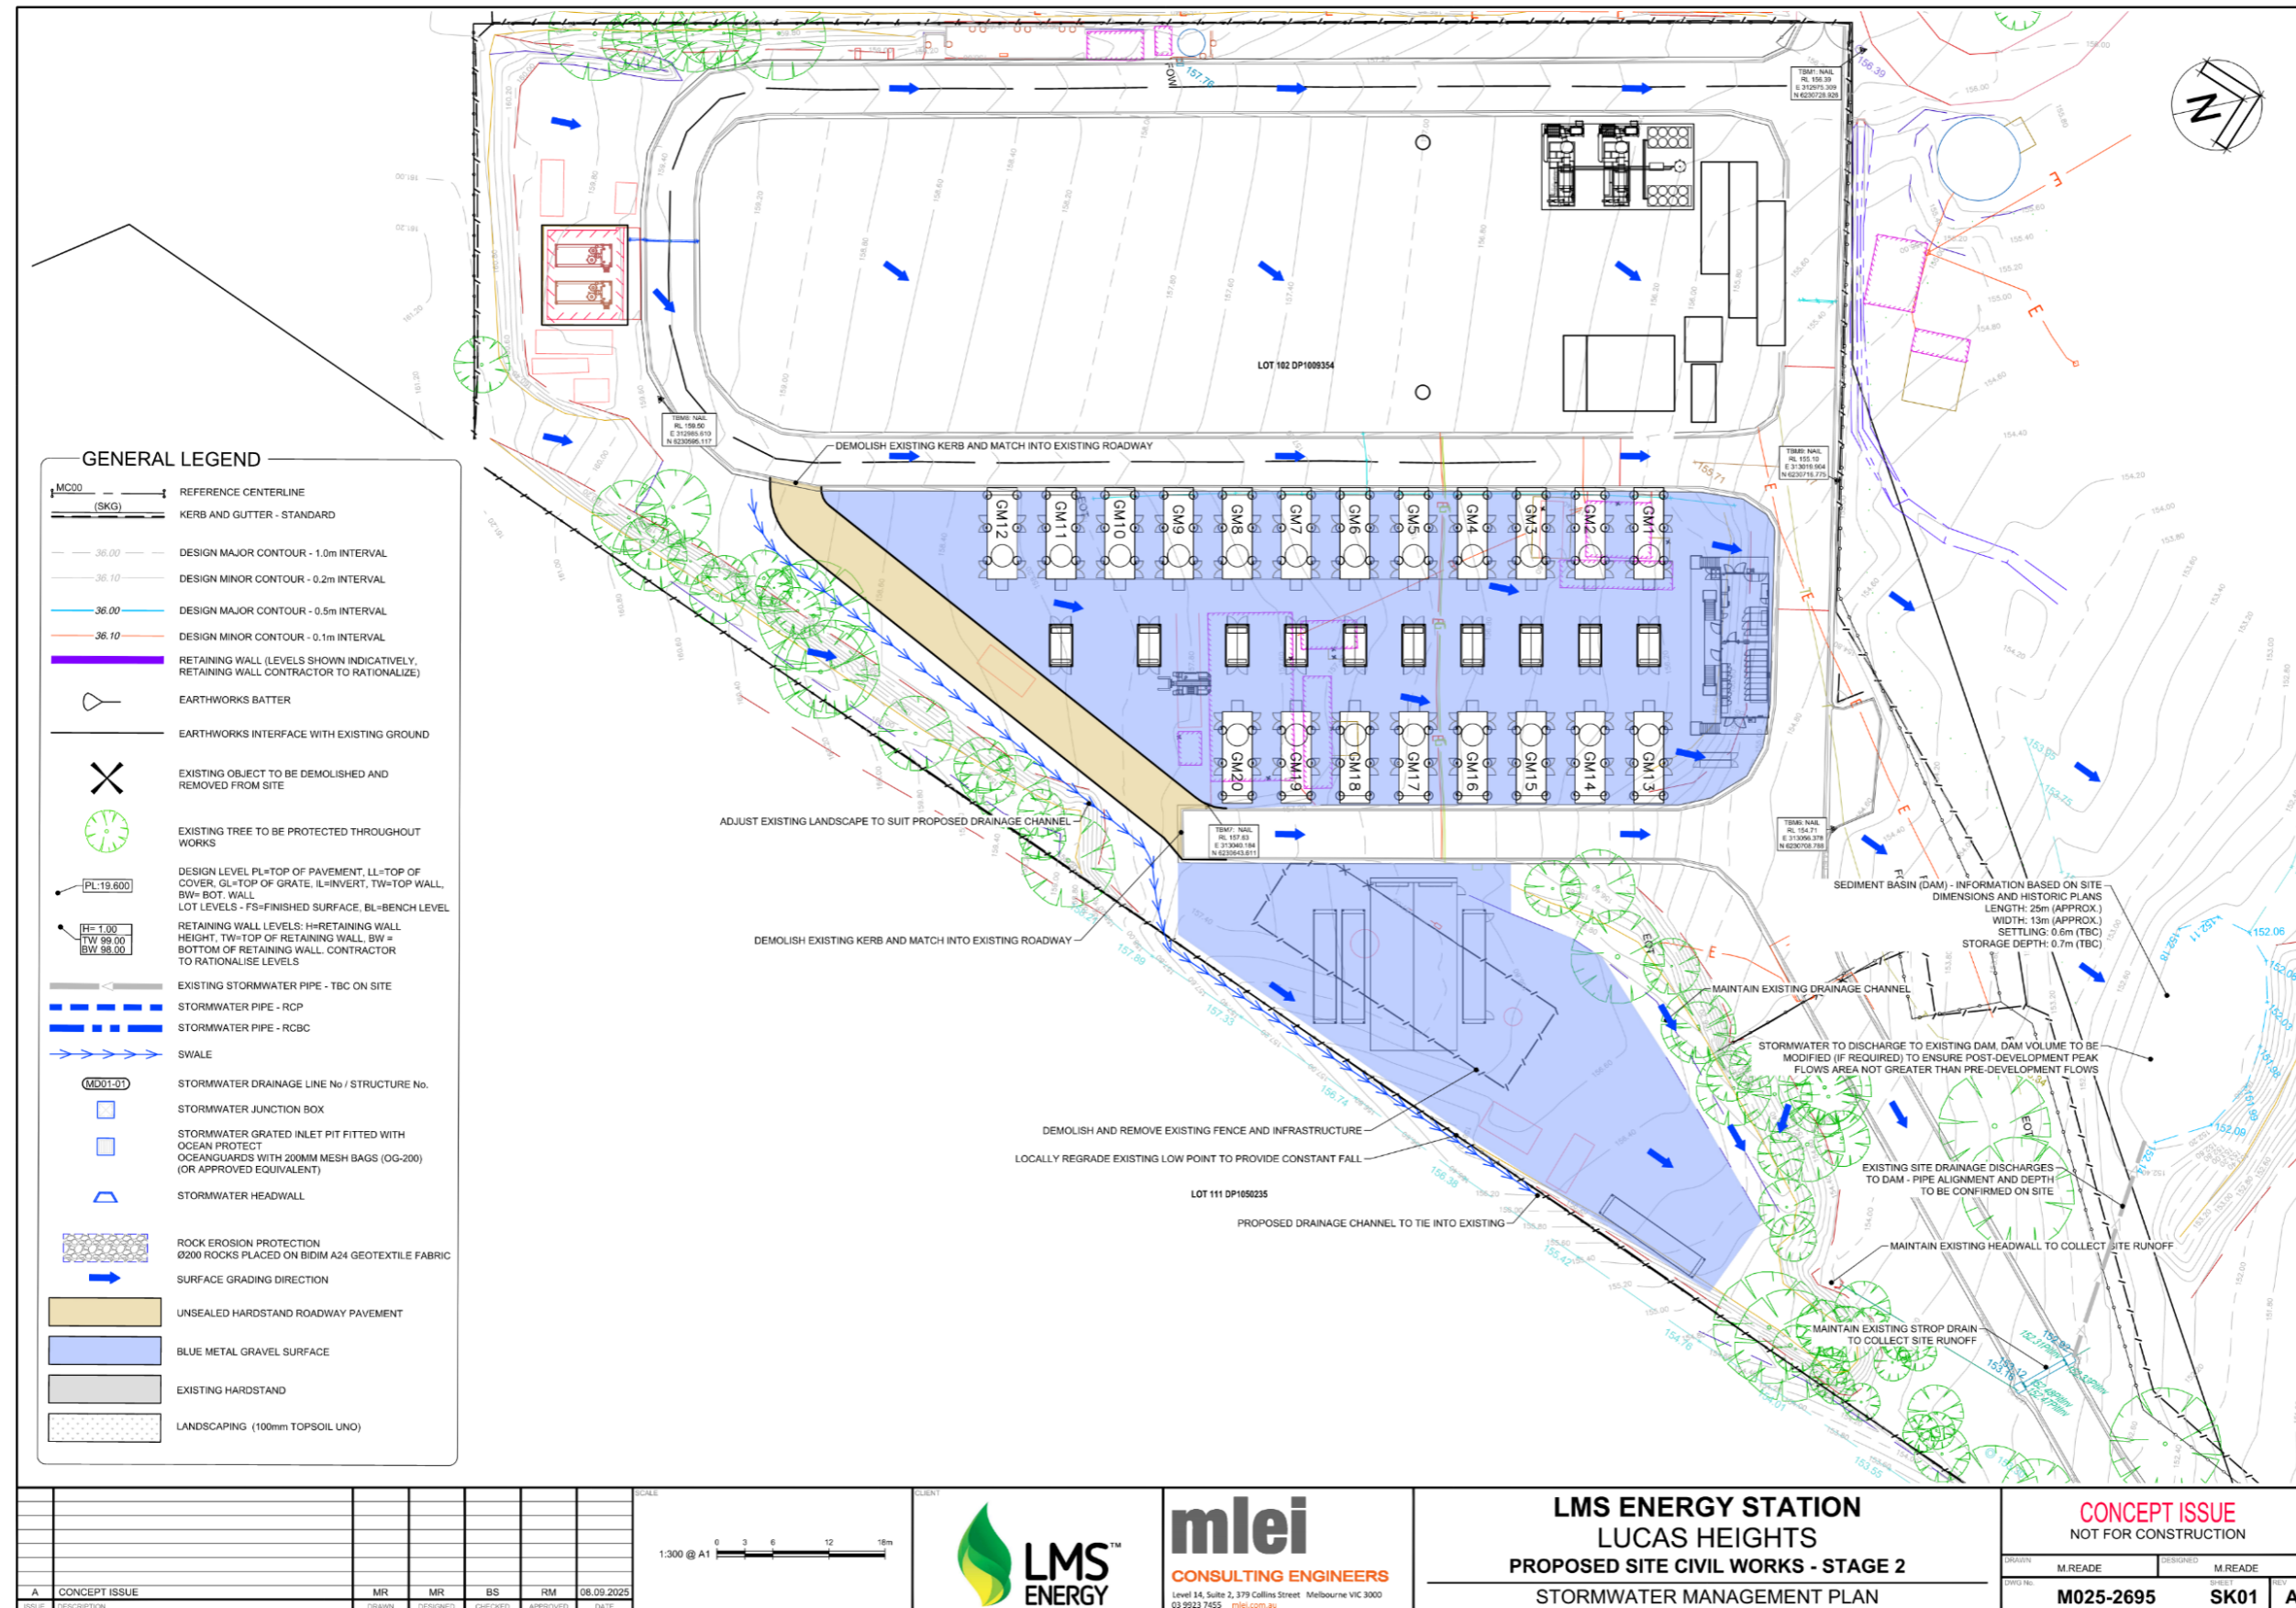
Proposed conceptual stormwater management plan (MLEI Consulting Engineers, 2025)
